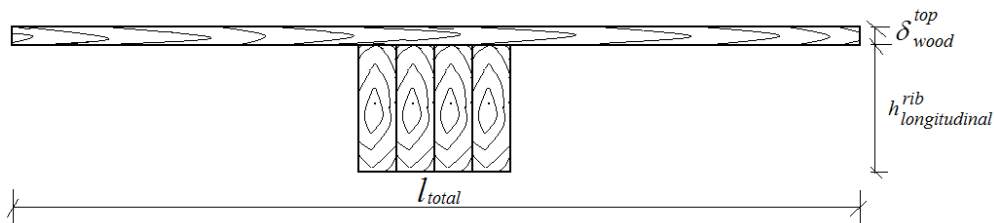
Schematic diagram of a light wooden slab with a I-beam.
